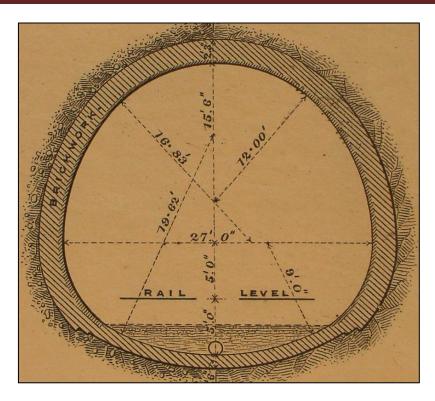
Contemporary c1900 drawn cross-section of the tunnel, dimensions in Imperial. Note the tubular drain below the track-bed.
